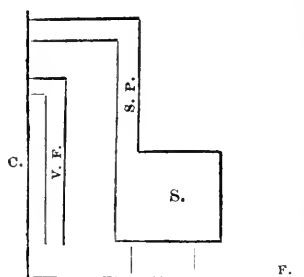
F., floor; S., stove; S. P., stove pipe; V. F., ventilating flue; C., chimney.
